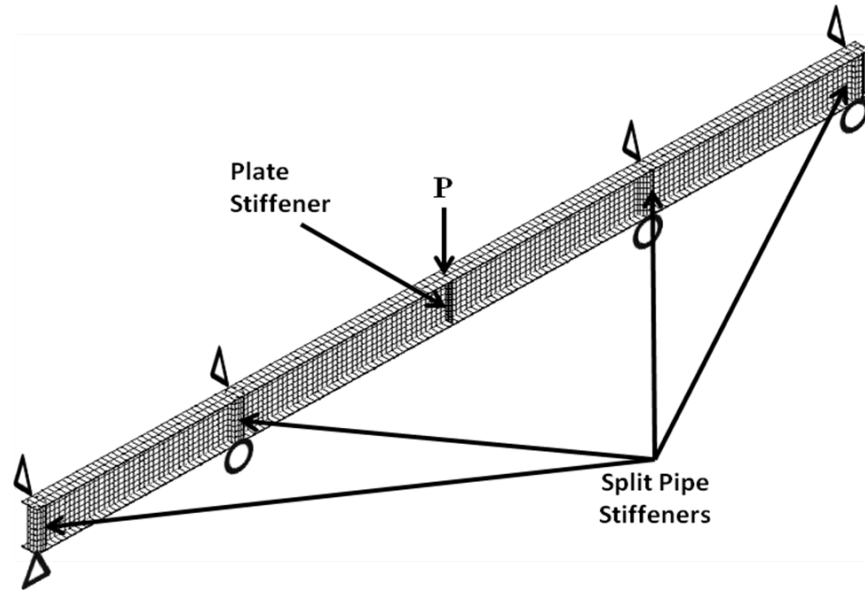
Three Span Girder Model with Split-Pipe Bearing Stiffeners
